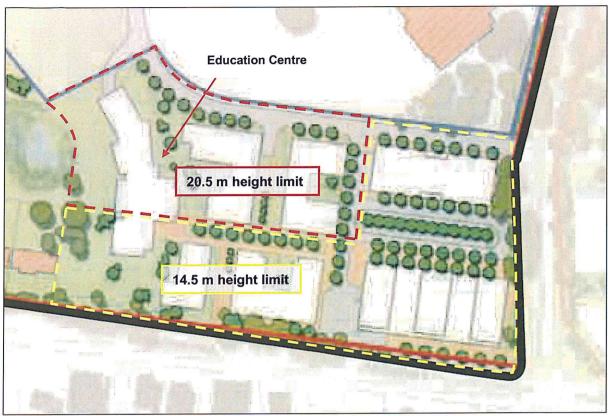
Wahroonga Estate Concept Plan Precinct C: Central Church
